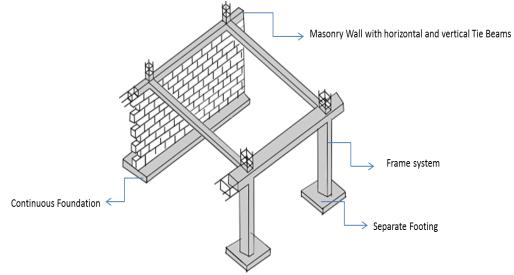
Masonry wall with vertical and horizontal tie beam combined with frame system (By Author)
